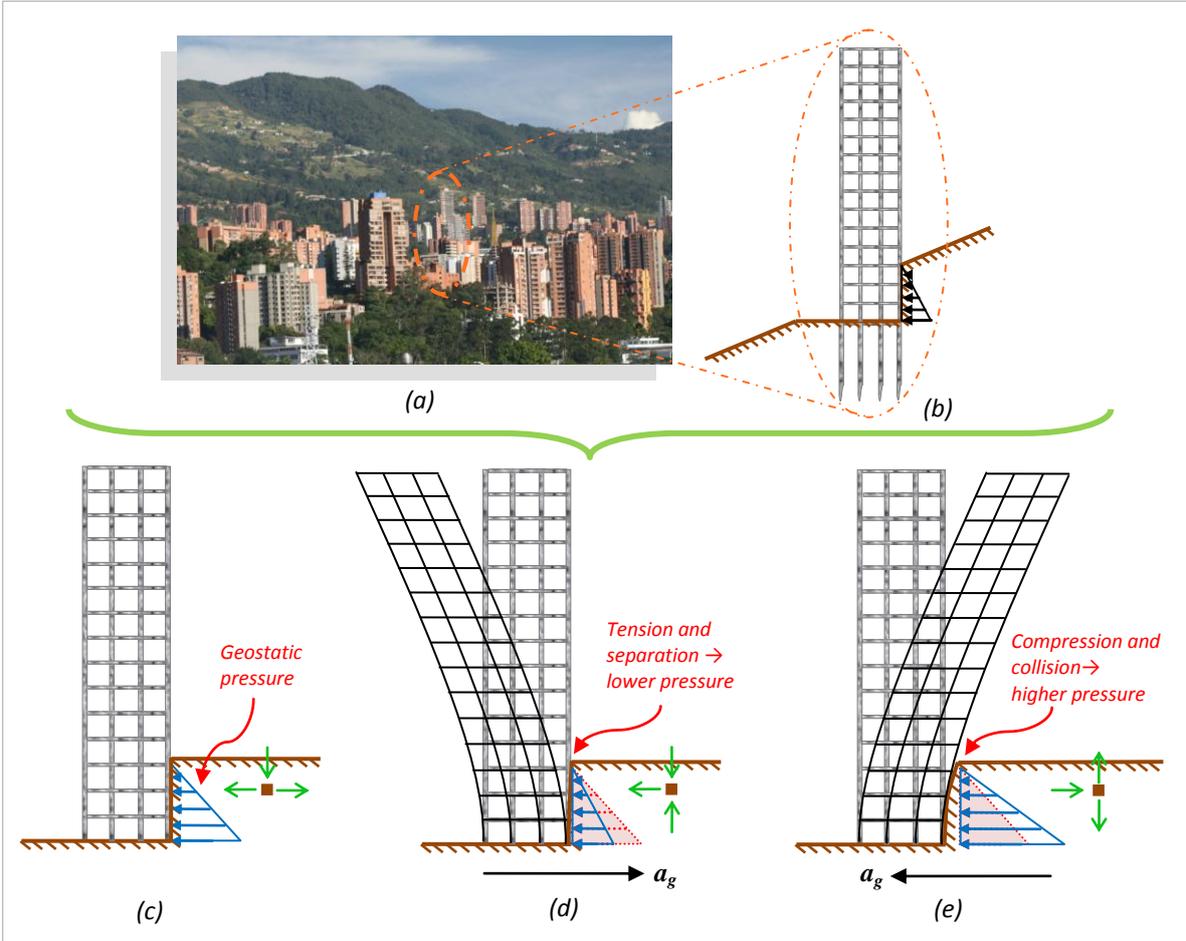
Outline of the situation under study: (a) Buildings on sloping ground in Medellín, Colombia; (b) Vertical plane showing the asymmetric lateral earth pressure against the building; (c) static conditions; (d) movement of the structure in the direction of soil pressure and (e) against the direction of soil pressure.
